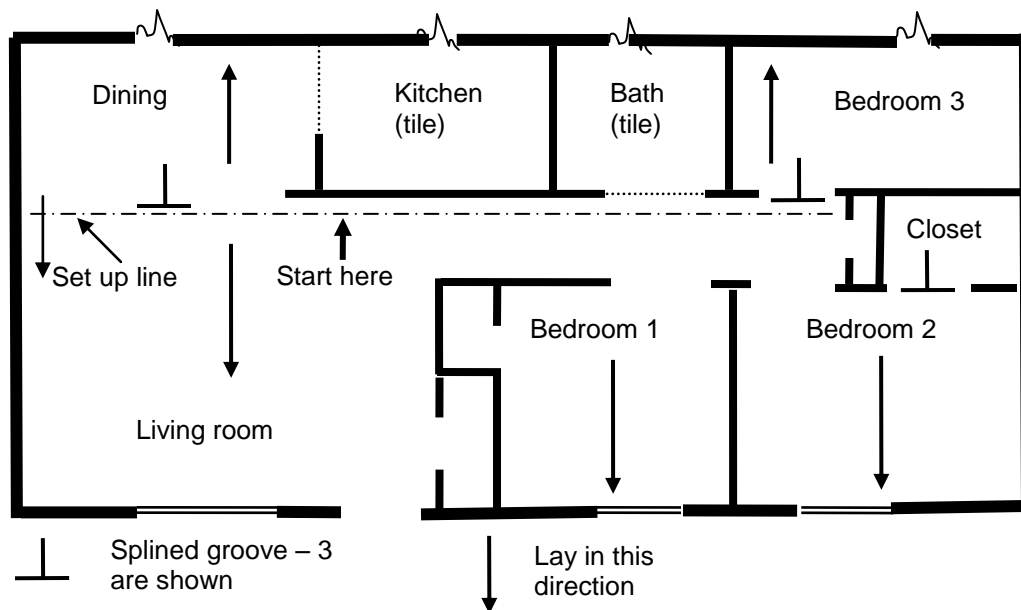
Floor plan shows correct procedure for laying strip flooring throughout a number of rooms
